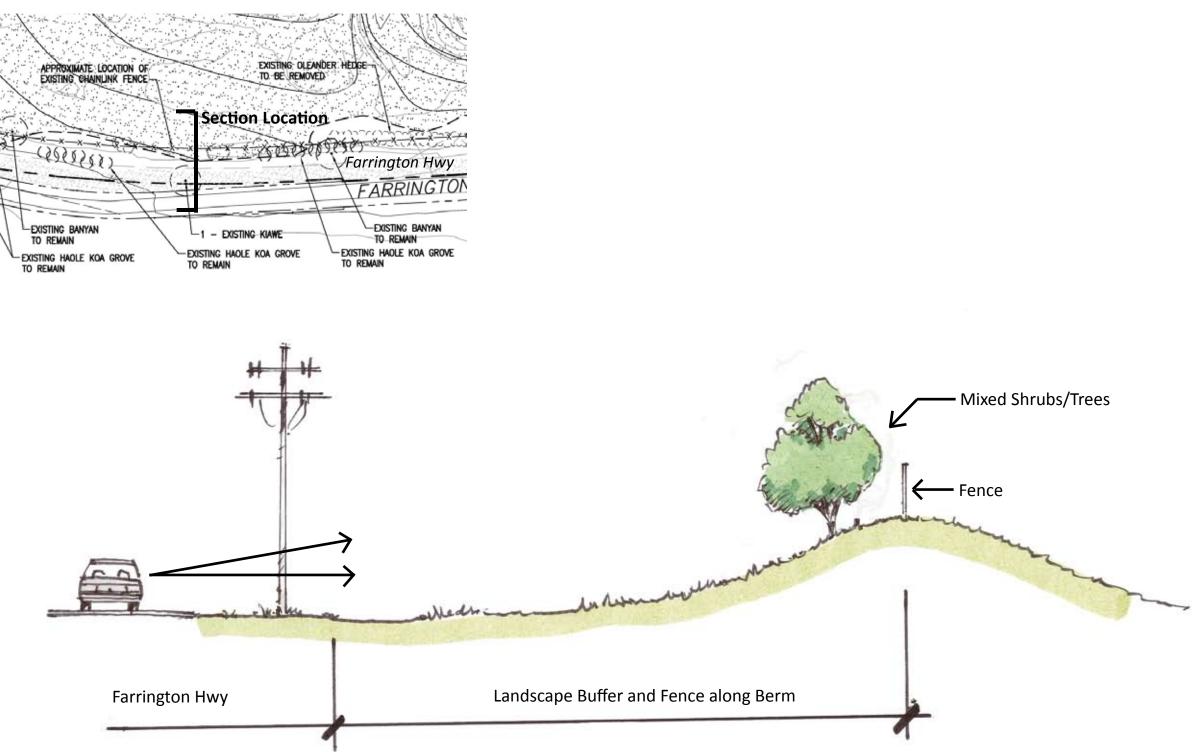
Plan and Section of Berm Along Farrington Highway
